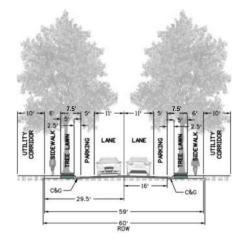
7 Residential Typical Section – Detached Sidewalk
